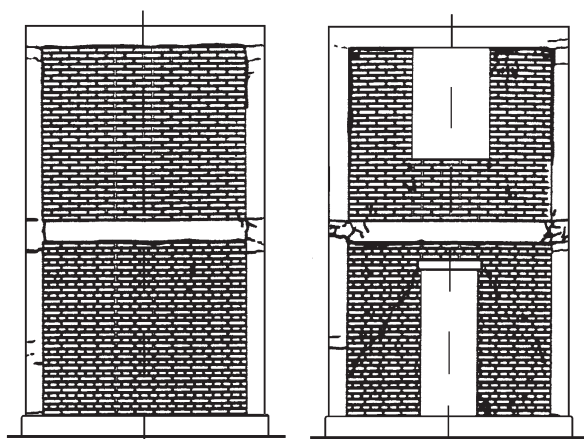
Cracks in masonry at the end of test: left - solid wall; right
